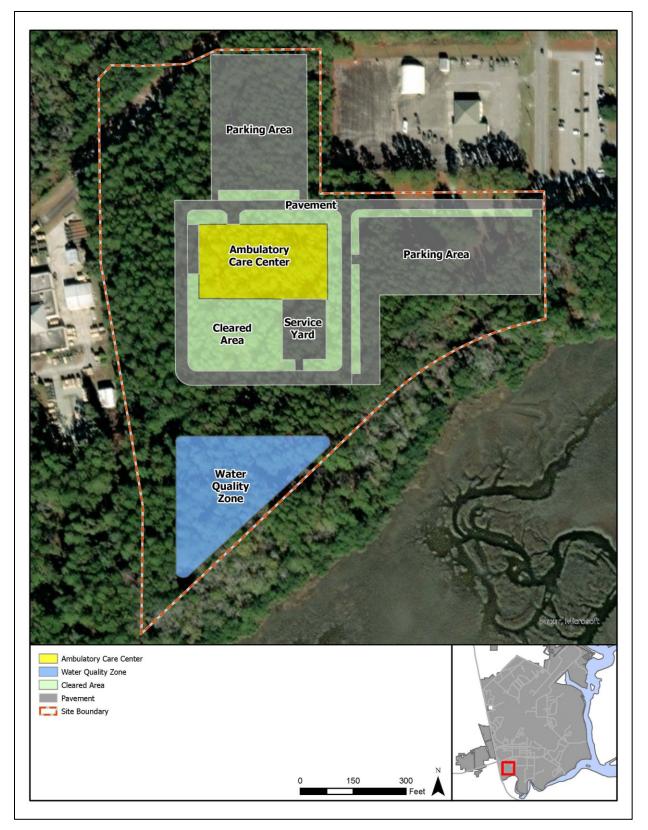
ACC Layout under Alternatives 1 and 2
